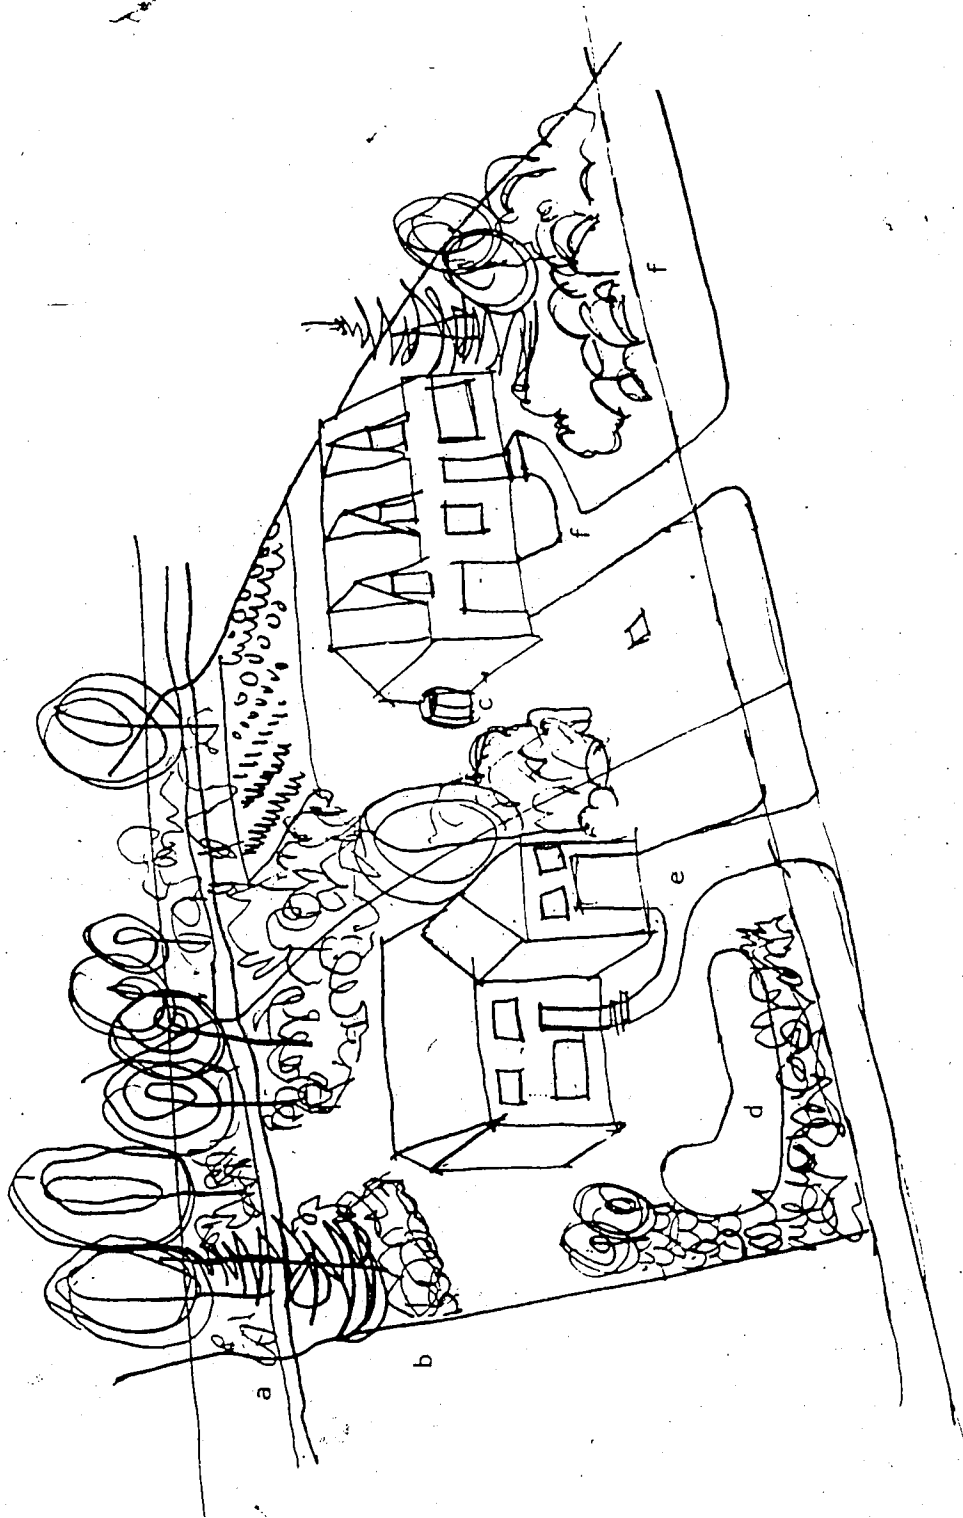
Best Management Practice for Residential Sites: a) open channel, b) natural design landscaping, c) rainbarrel, d) temporary ponding on lawn, e) grass pavers, f) porous pavement. (Source: author).
